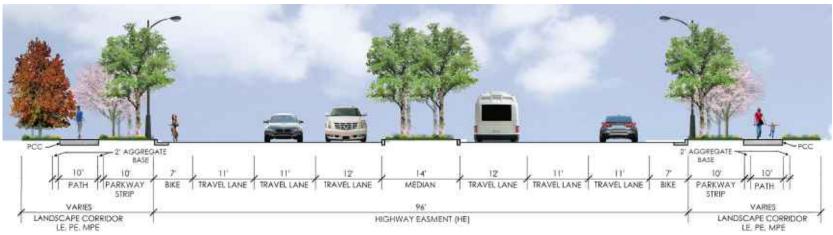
Fiddyment Road - Section A, 6-Lane Arterial, South of Placer Parkway
